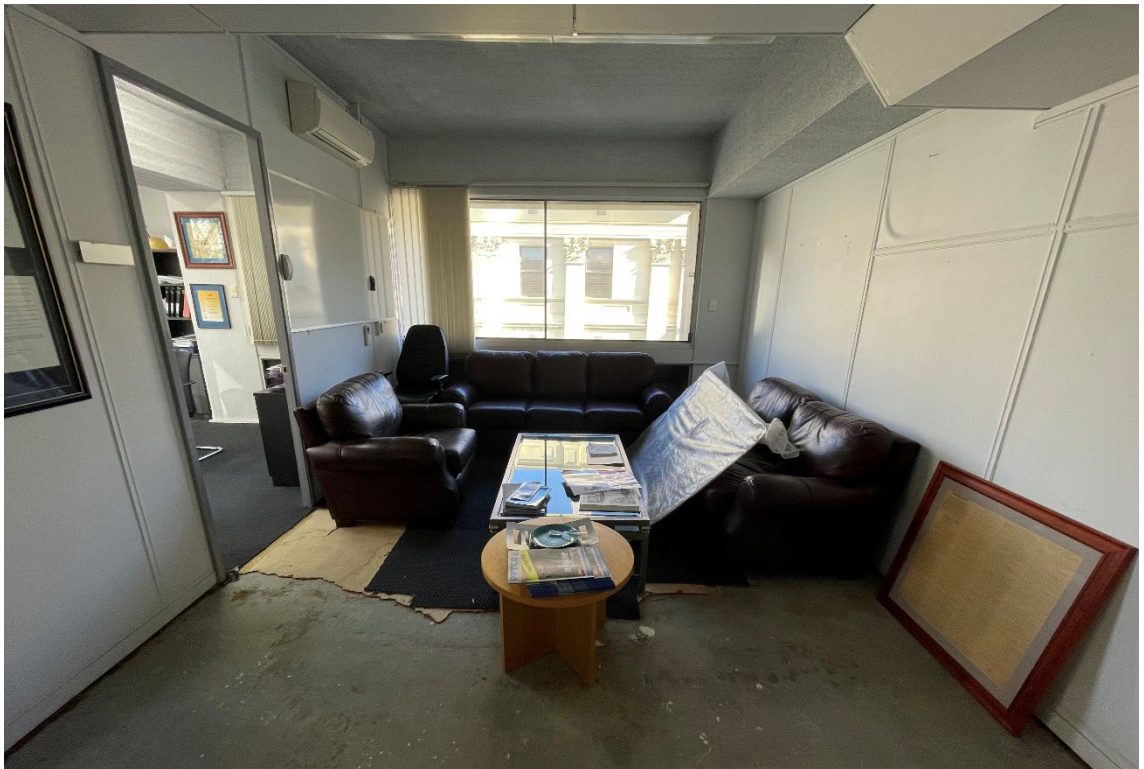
Finishes damaged by water ingress on Level 2
